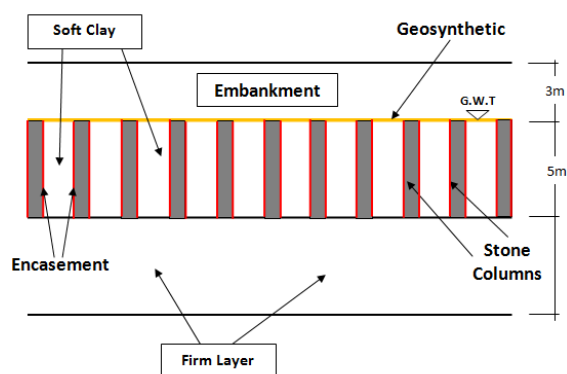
Cross-section of reinforced embankment built on soft soil reinforced with GECs
